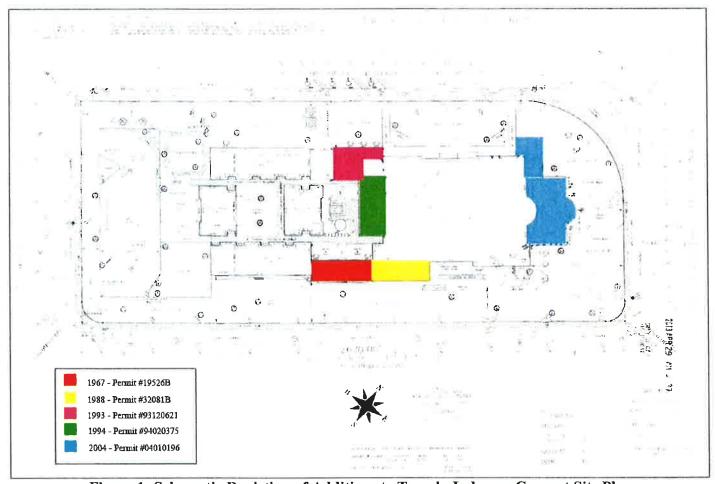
Schematic Depiction of Additions to Temple Judea on Current Site Plan
